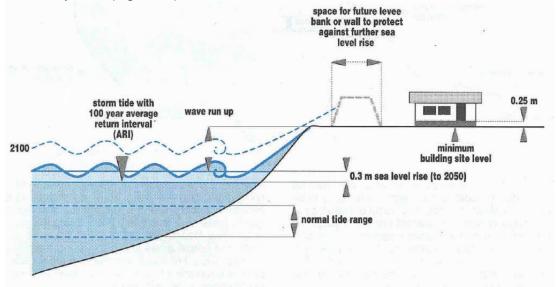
Minimum elevation for buildings set back from the water's edge (Source: Coastal erosion, flooding and sea level rise standards and protection policy 1992).
